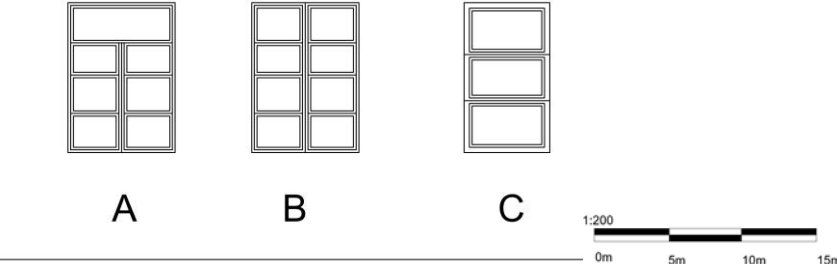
Floor plan of Gazi Elementary School; (Author, 2019)
